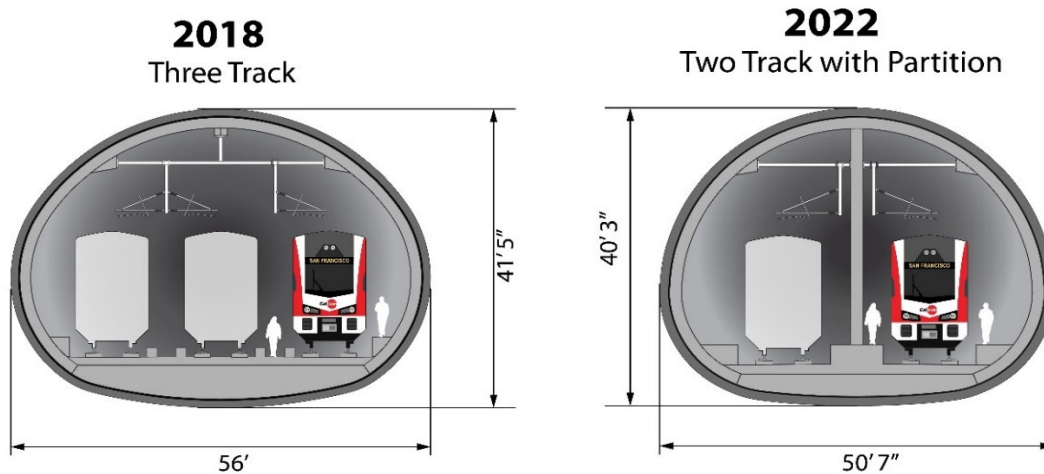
Cross Section of Proposed Two-Track Tunnel Segment Compared to Previous Three-Track Tunnel Segment
